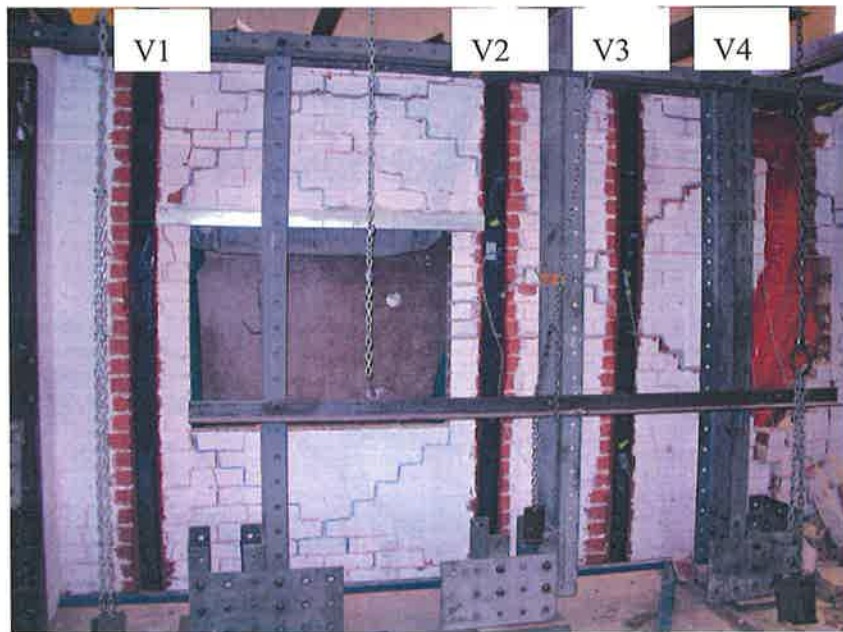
Photo for cracking and failure patterns of Wall 2
